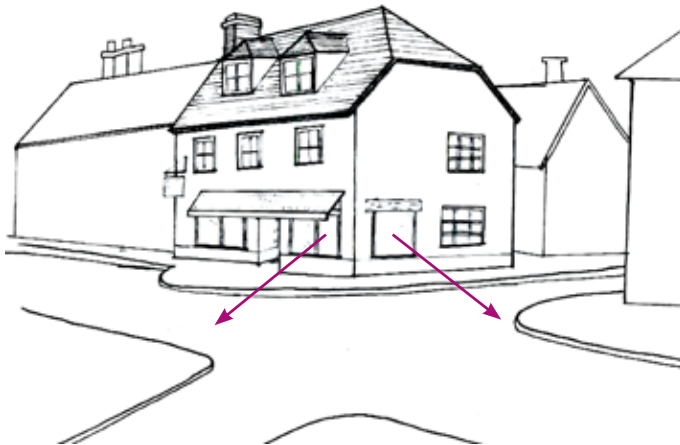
Windows on both street facing façades provide enhanced natural surveillance.
